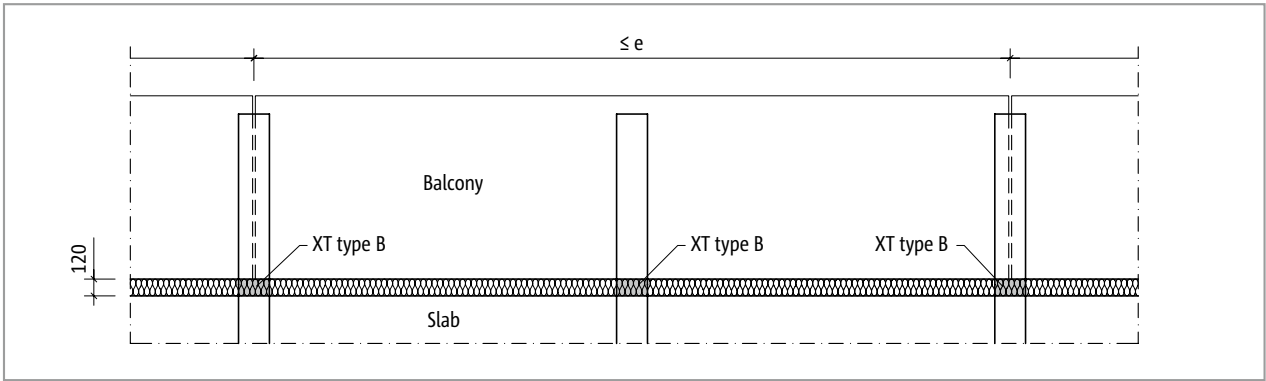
Schöck Isokorb® XT type B: Expansion joint arrangement
